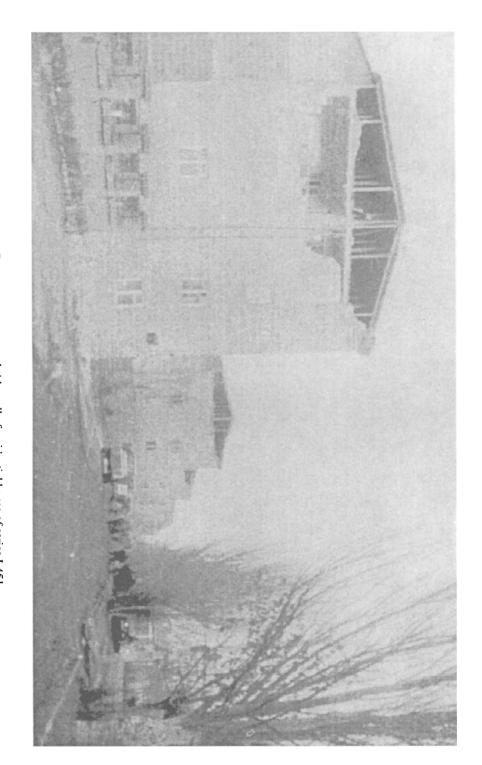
Damage to parapet and side wall of residential house of series I-451.
